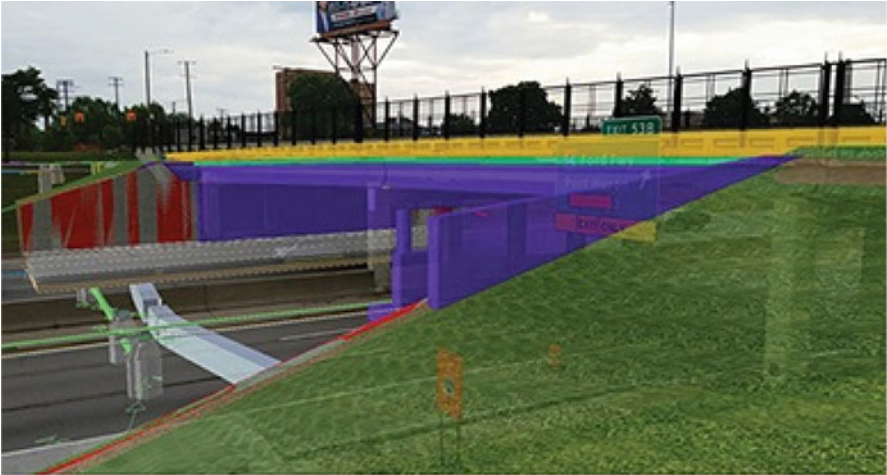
A snapshot of AR use in Michigan to propose design elements, overlaid onto the existing conditions on the bridge carrying Milwaukee Avenue over I-75. Adapted from [1]
